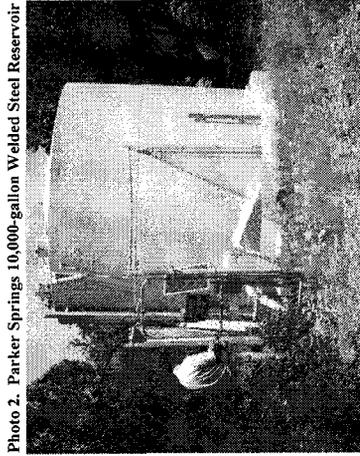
Parker Springs 10,000-gallon Welded Steel Reservoir
